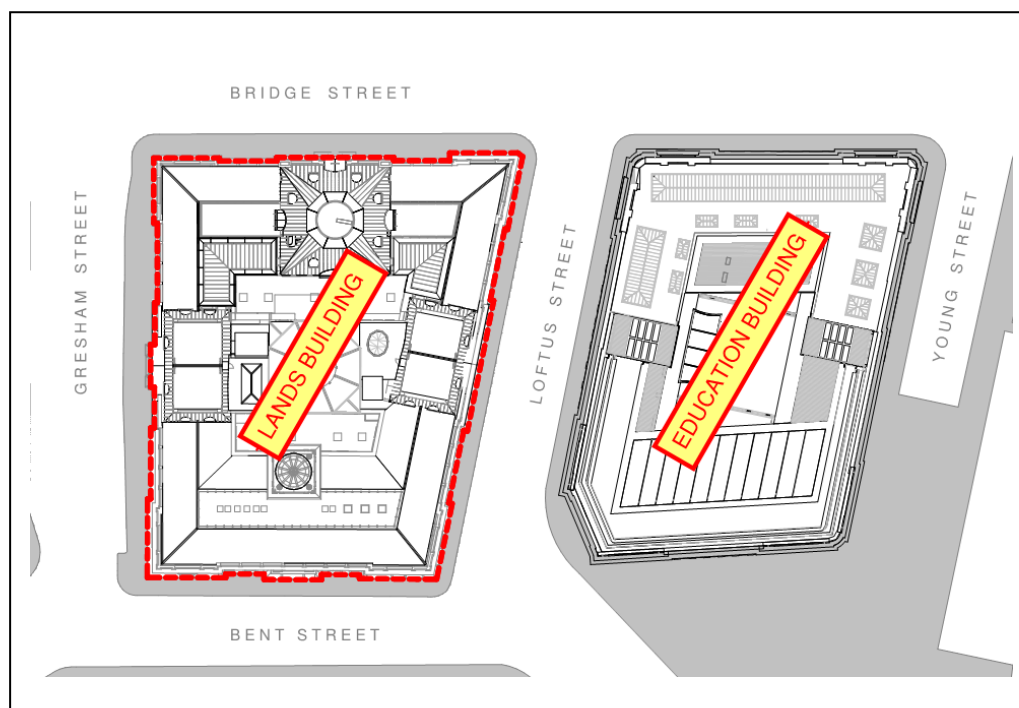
Lands & Education building connected at basement level 3 via tunnel.
